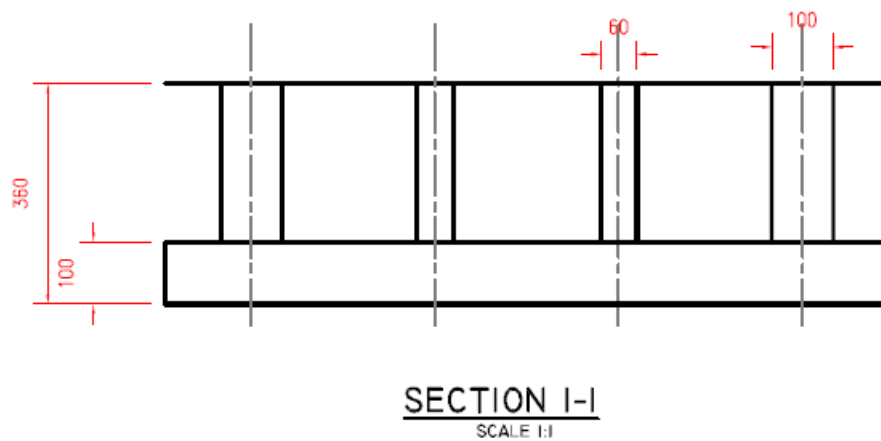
Eight-Column Semi-Submersible Model Plan 2
